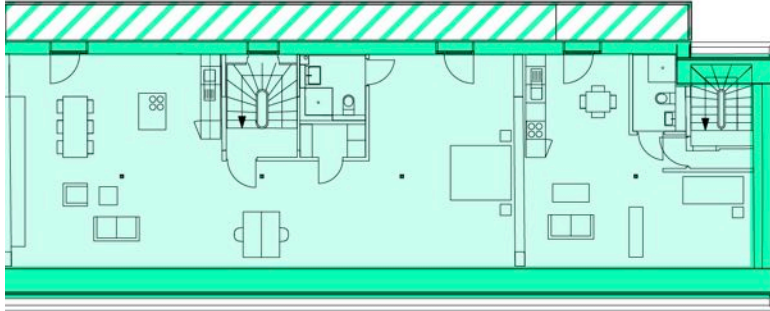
Pfuher Straße 4-8. Floor plans (1:250)
